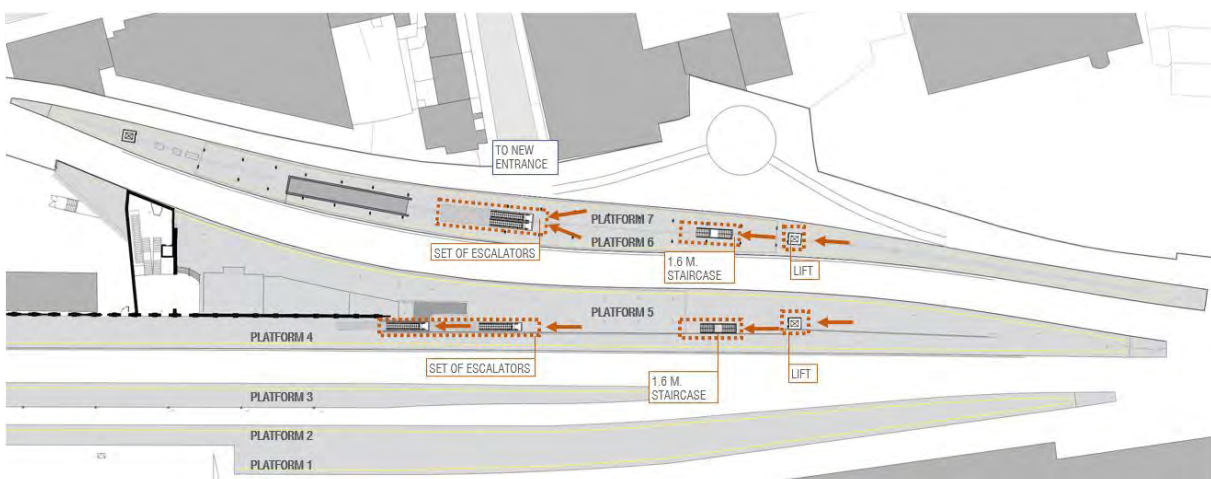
Platform facilities - proposed additional means of access to the platforms
